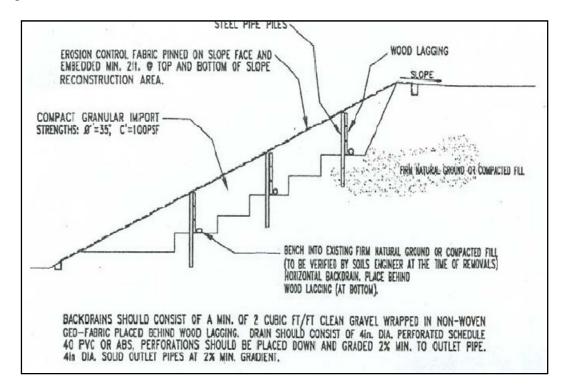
Pipe pile and wood lagging repair (Day, 1997)
